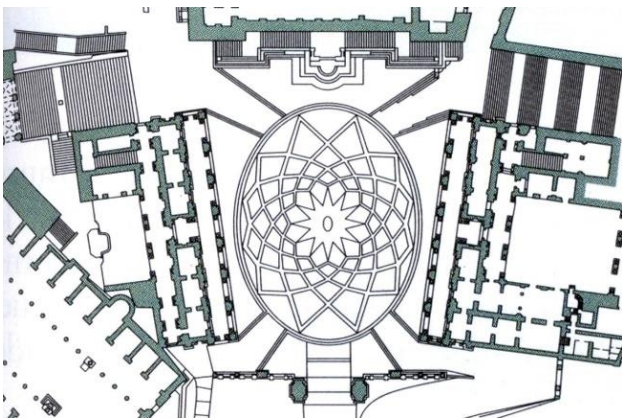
Michelangelo, Piazza del Campidoglio floor plan, Rome, 1567
